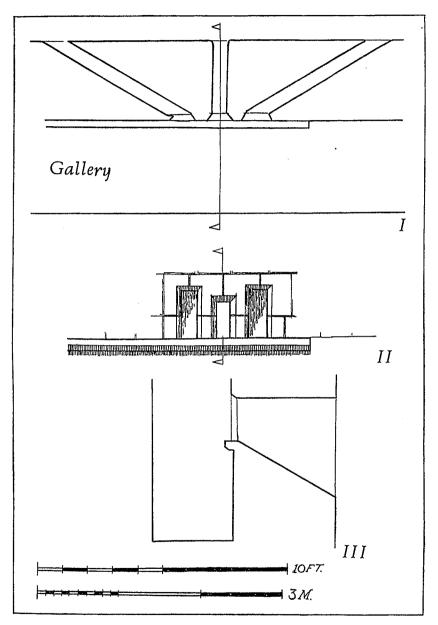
Plan (I), internal Elevation (II) and Cross-section (III) of triple Slits in lower Gallery of the Avranches Tower.
